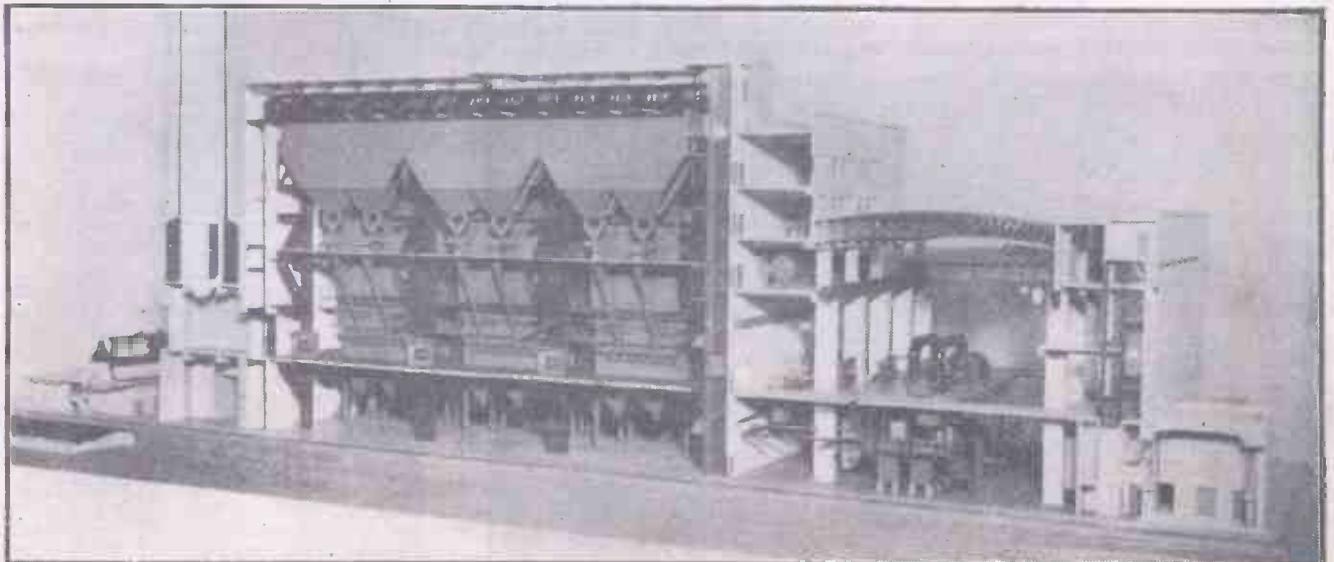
Interior view of the sectional model of Staythorpe generating station, showing all plant and machinery contained in one station unit. From left to right can be seen the coal-handling plant, the chimney, coal elevator, three boilers with automatic coal feed, the turbo-alternator house, showing all details of auxiliaries that complete the unit, and the overhead crane. The entrance hall and offices are on the extreme right.
